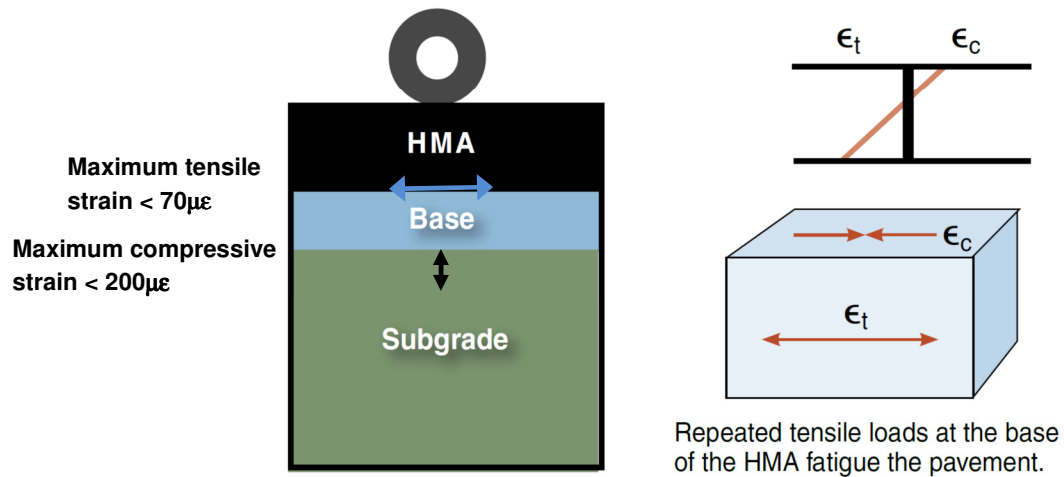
Fatigue Cracking Schematic [Newcomb, Willis & Timm, 2010]
